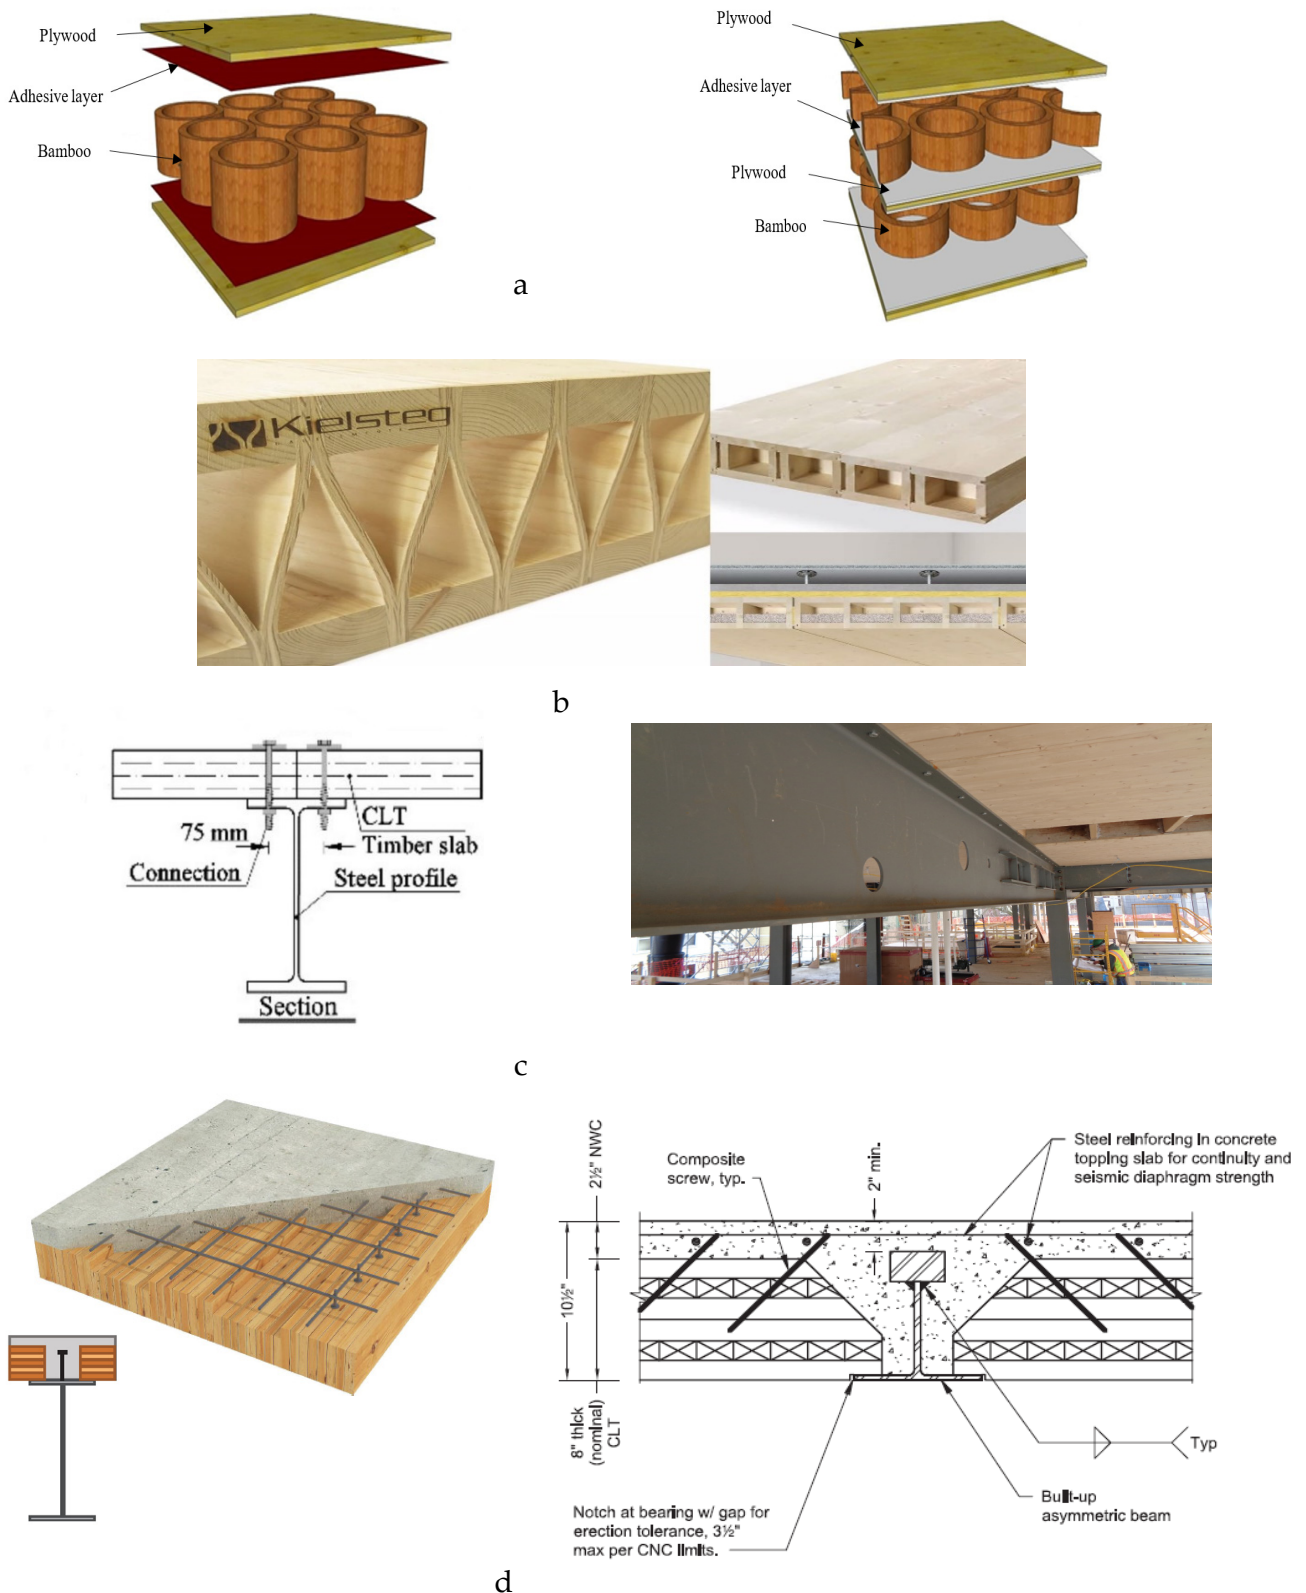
Hybrid floor systems: (a) lightweight sandwich panel made from plywood and bamboo [79]; (b) Kielsteg LVL/CLT and CLT box floors [82]; (c) STC floor made of CLT on steel girders [88], photo courtesy of Odeh Engineers, Inc. (North Providence, RI, USA), also see Figure 1c; and (d) timber–concrete composite (TCC) floor [84] showing AISC-SOM composite timber deck and steel beam detail [83].
